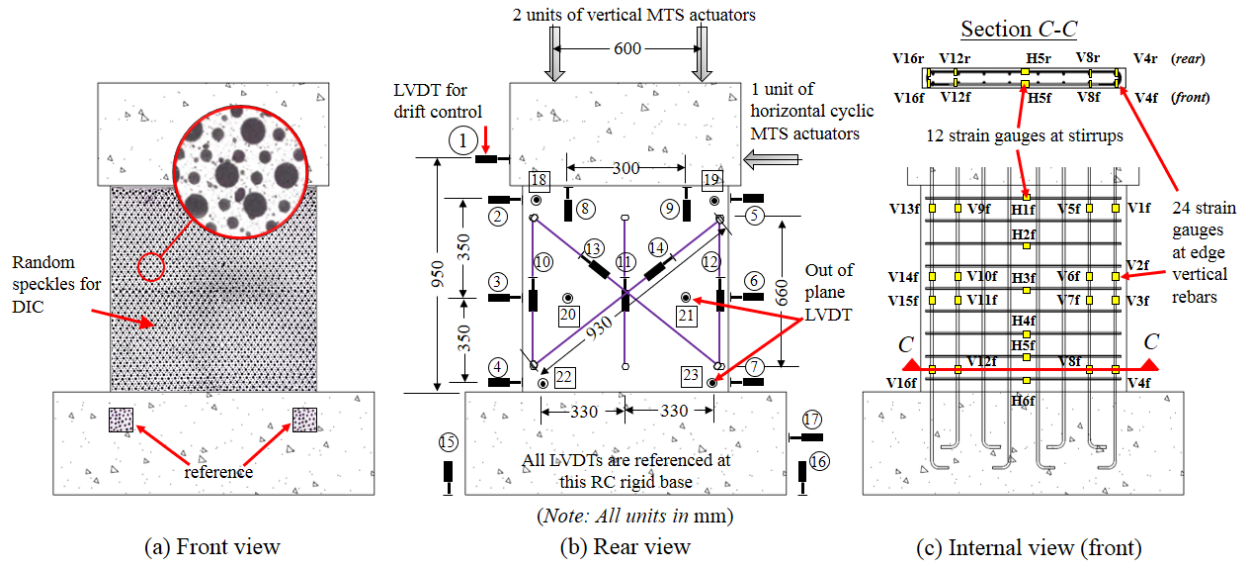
Instrumentation (a) Front view with DIC speckles (b) Rear view with LVDTs (c) Inside with strain gauges
